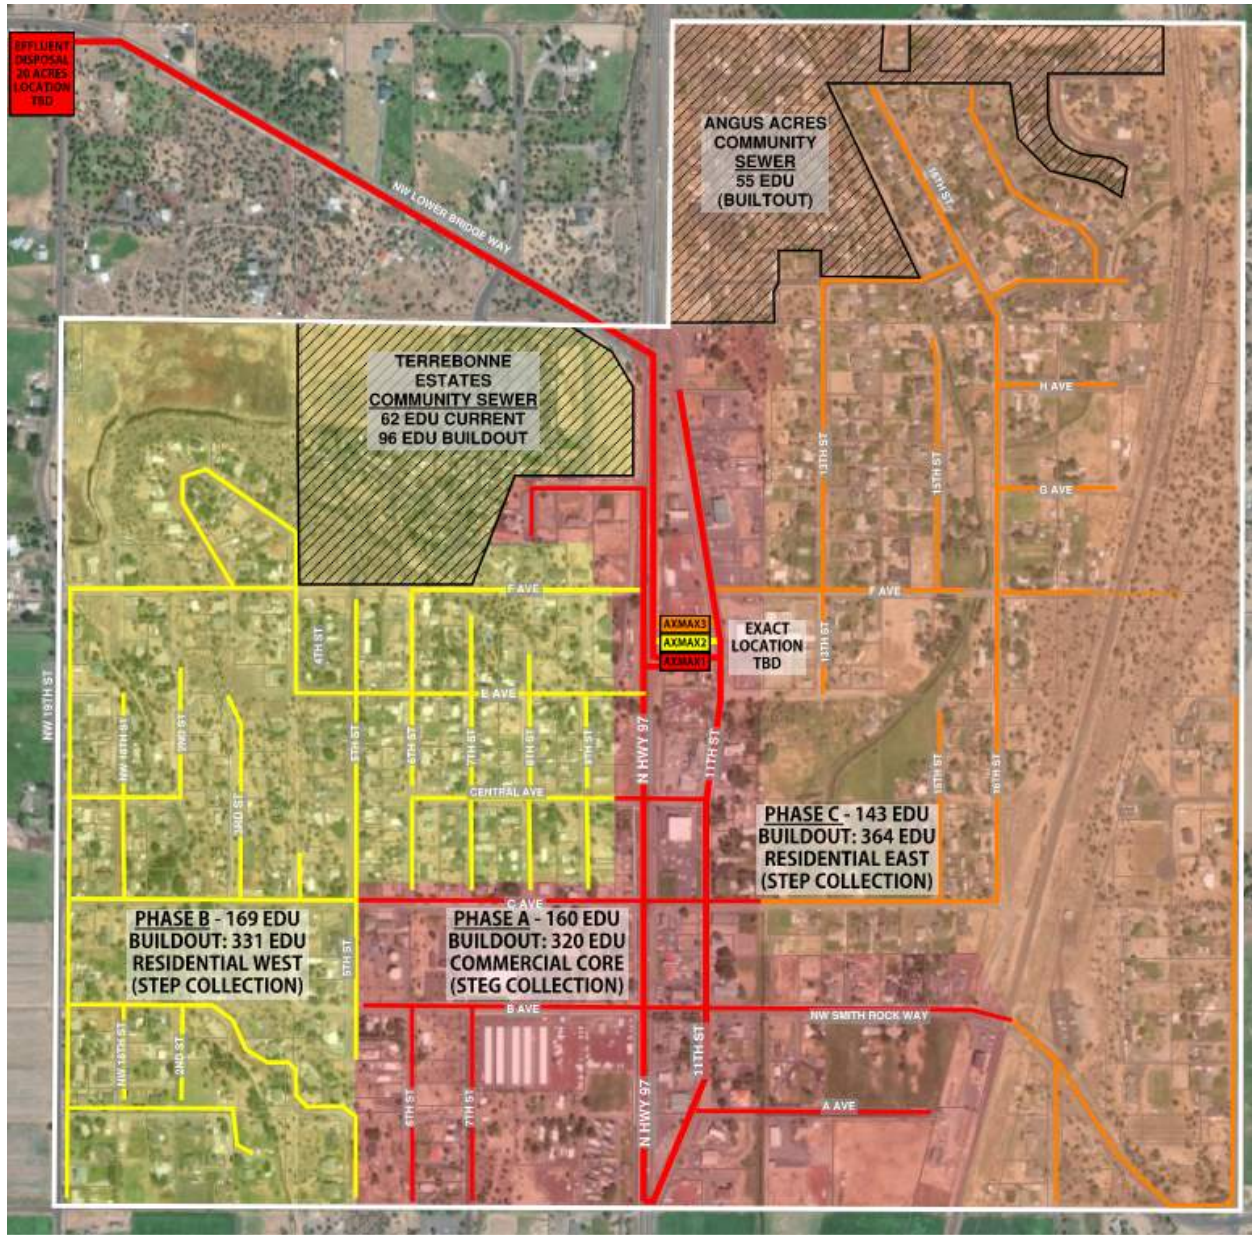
Alternative 2 Layout - Packaged Treatment System and STEP/STEG Collection
